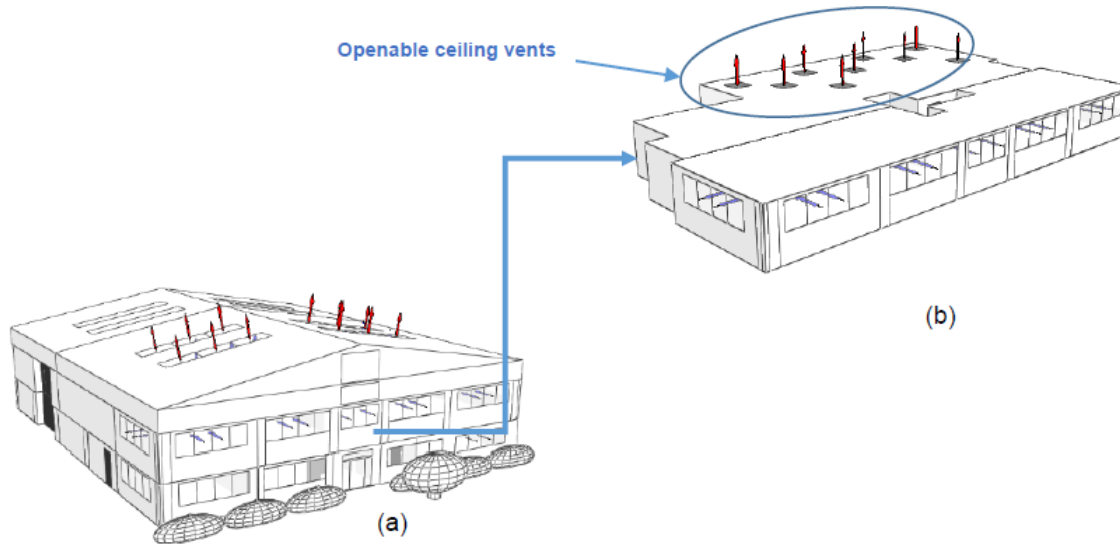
Principle of ANV strategy implemented in refurbishment, whole building (a), first floor open plan office (b)
